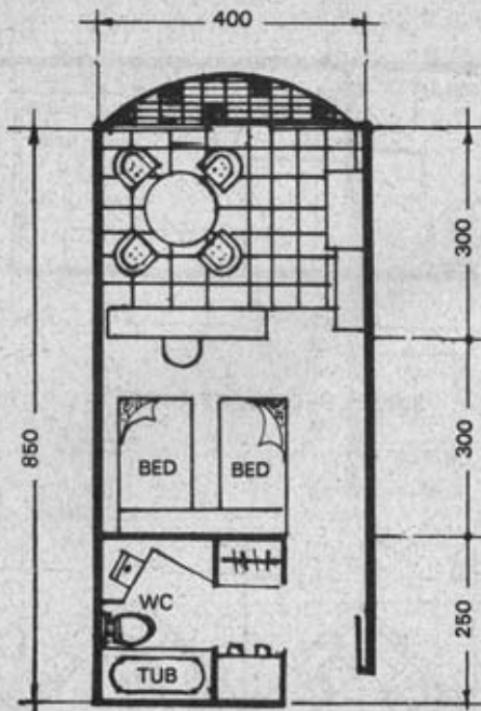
FLOOR PLAN OF STUDIO ROOM OR SUITE
